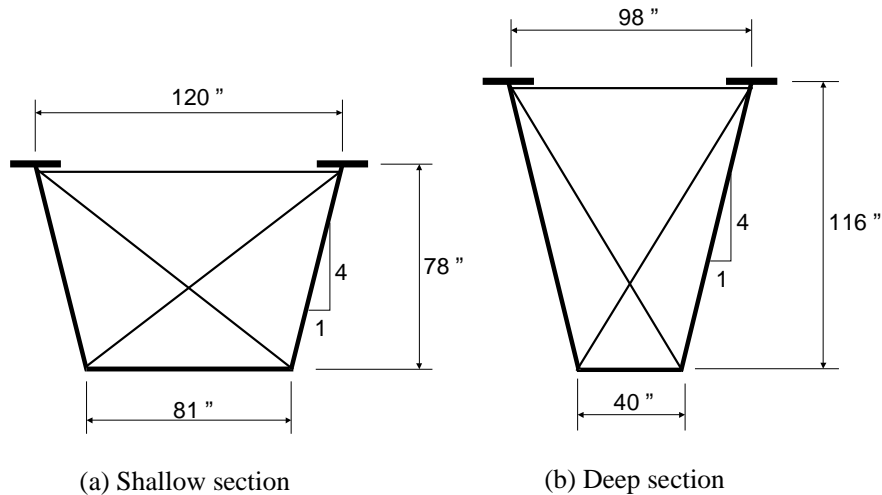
Two different cross sections of box girders with internal X-frames
